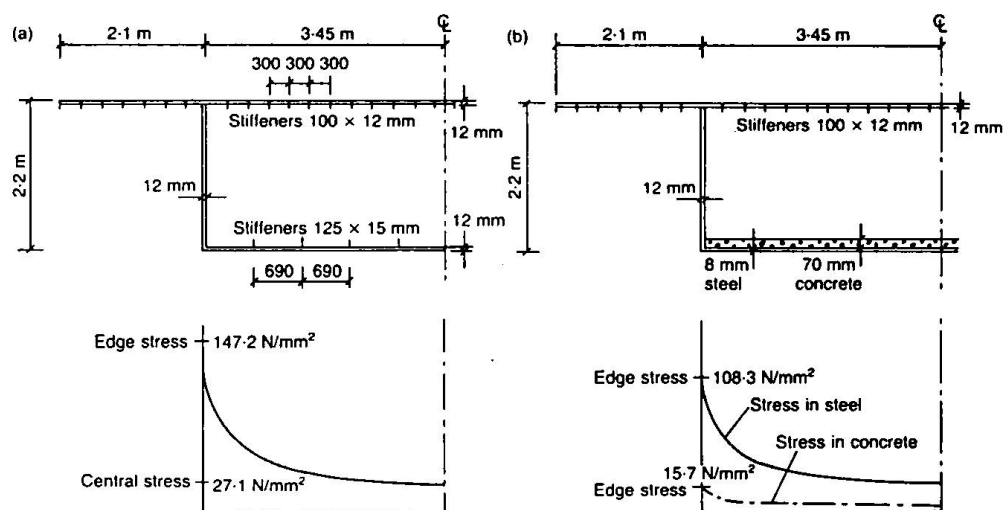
Stress in a typical bridge girder. (a) Stiffened bottom flange, (b) Composite bottom flange
